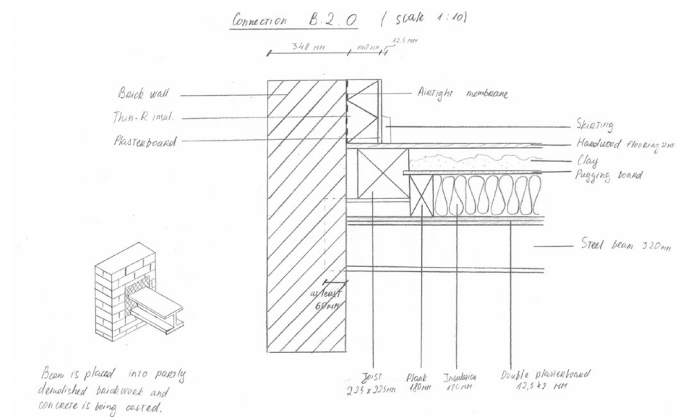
Sketch: Connection of brick wall with rafts, and the new insulation and connection the steel beam with brick wall on the ground floor
